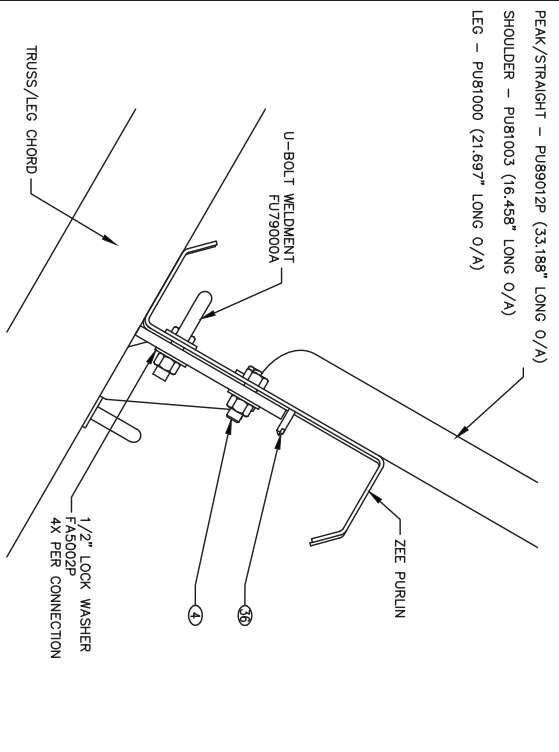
70'-80' VP TYPICAL TRUSS CONNECTIONS - END VIEW
